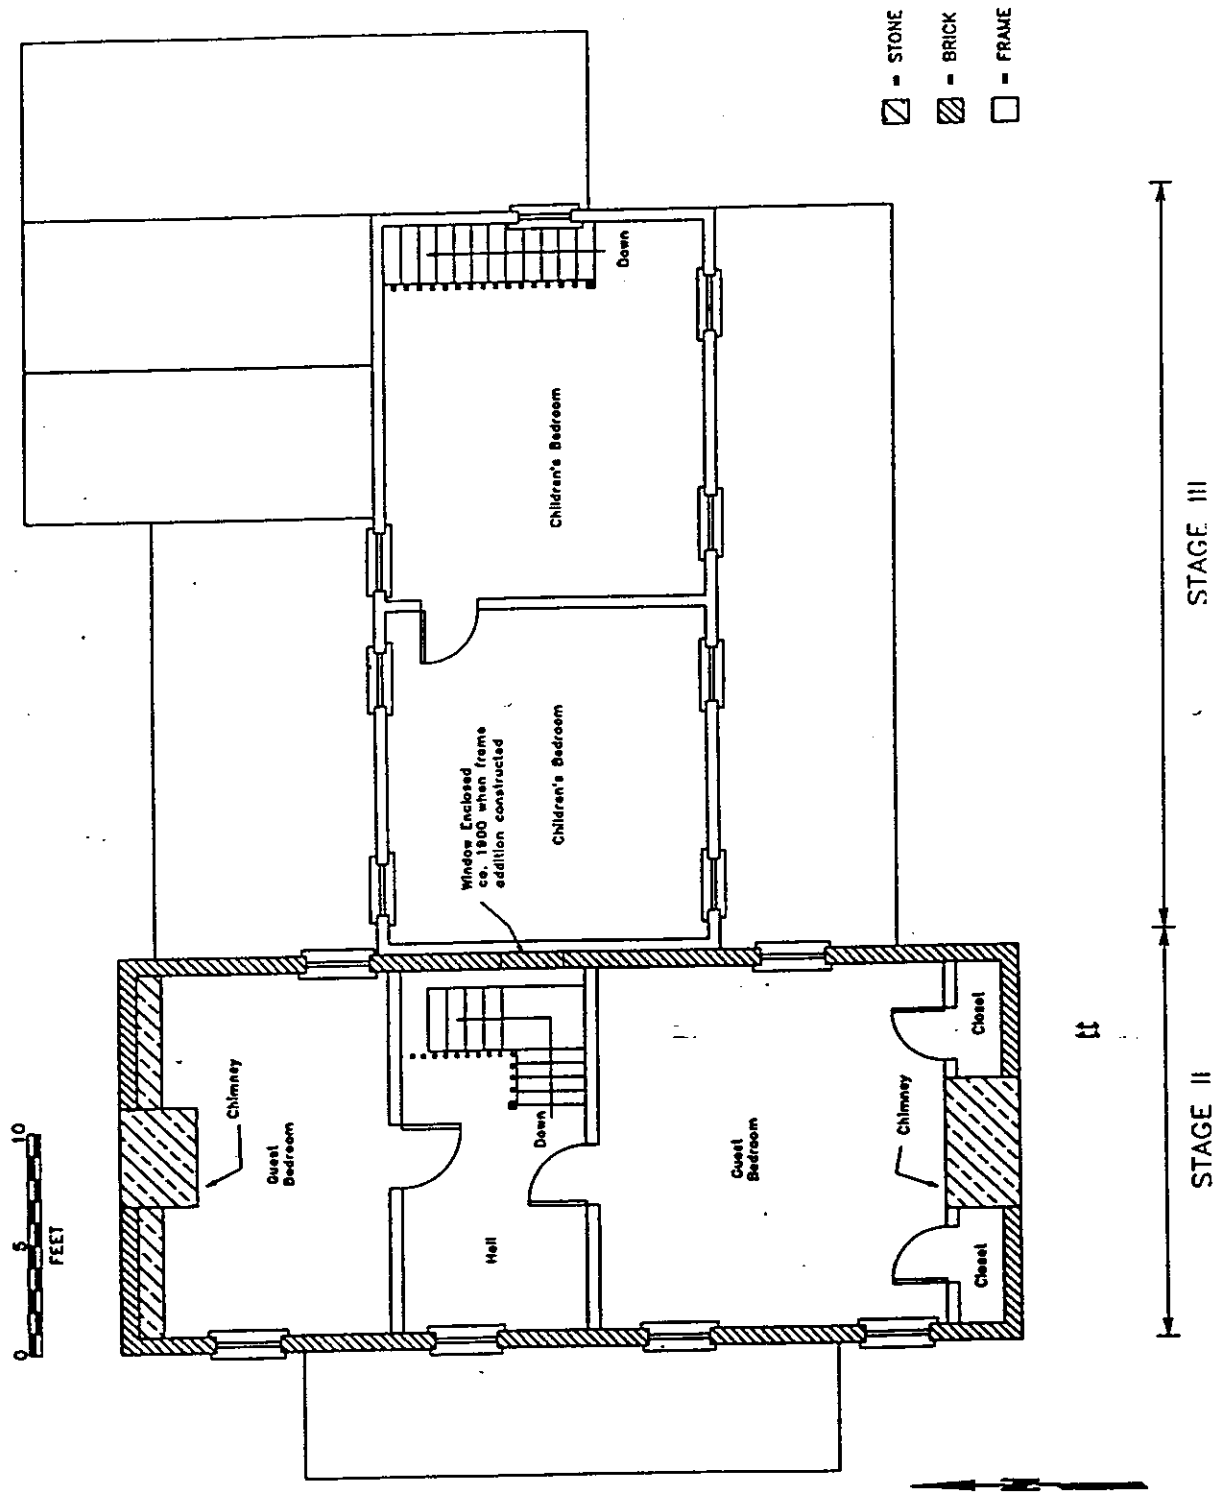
Existing second story floor plan of the George Brunk farm house, 1994.
